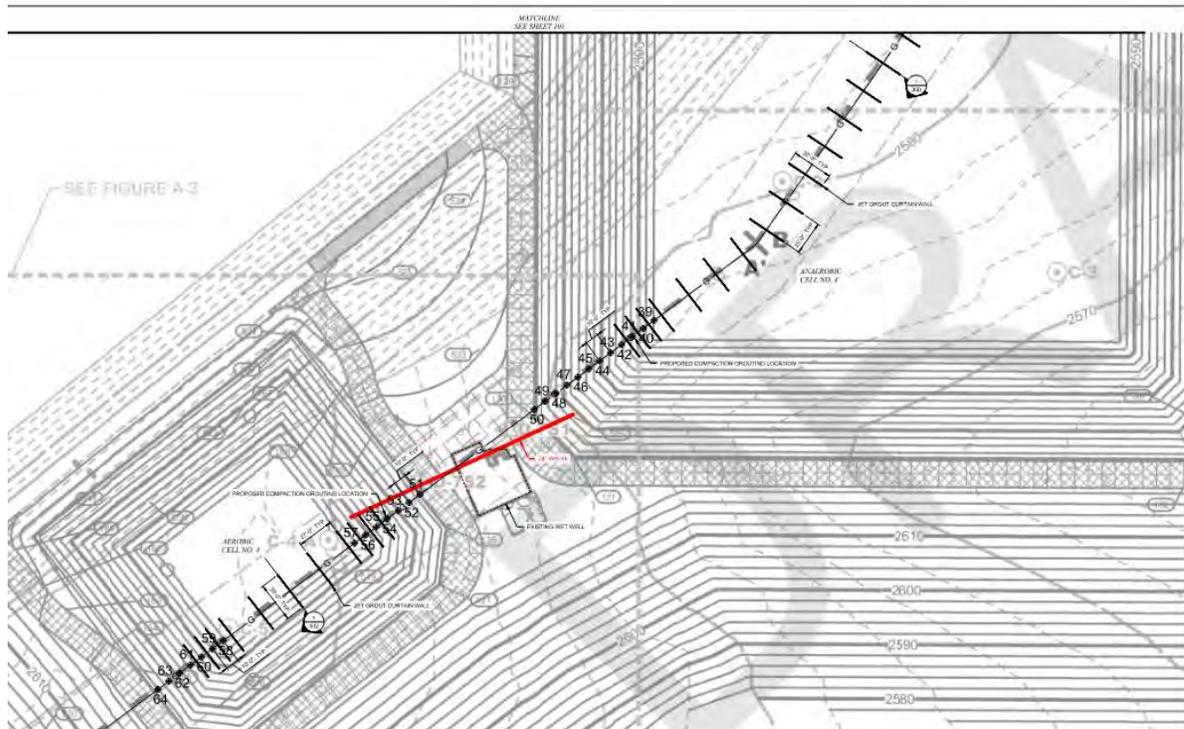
Area 2 Ground Improvement Plan – Compaction Grouting and Jet Grout Curtains
